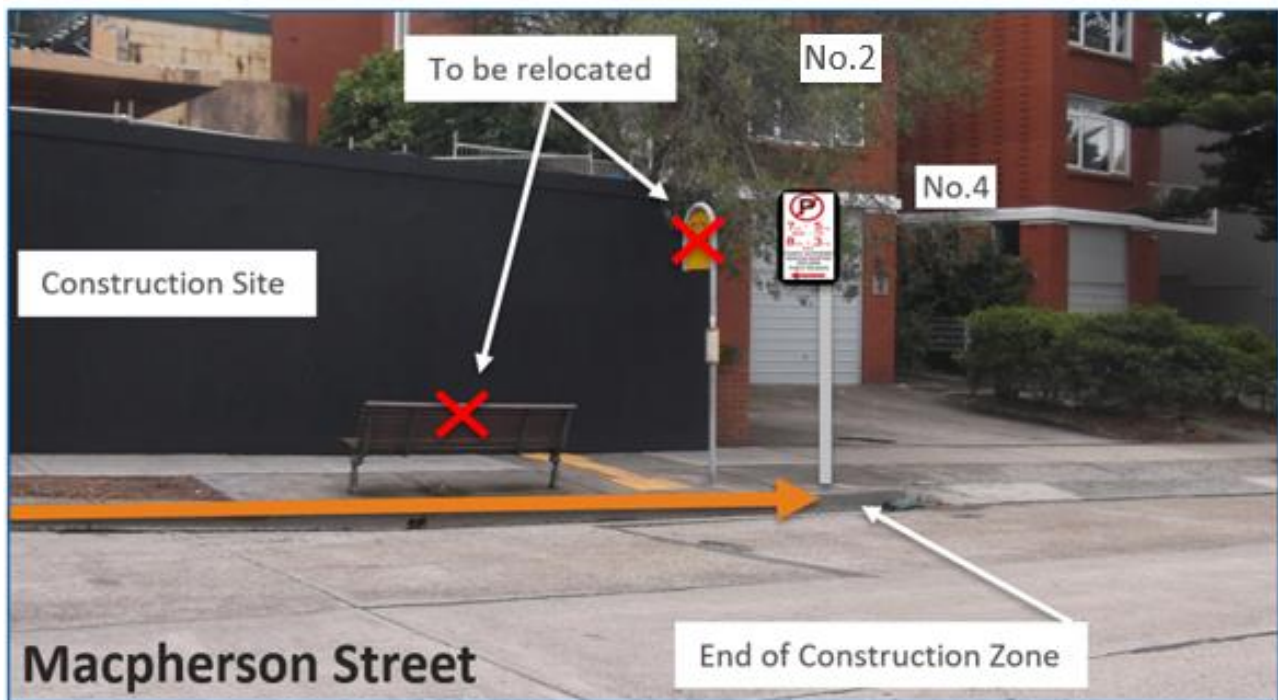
Street view image of the proposed construction zone adjoining property No.2
